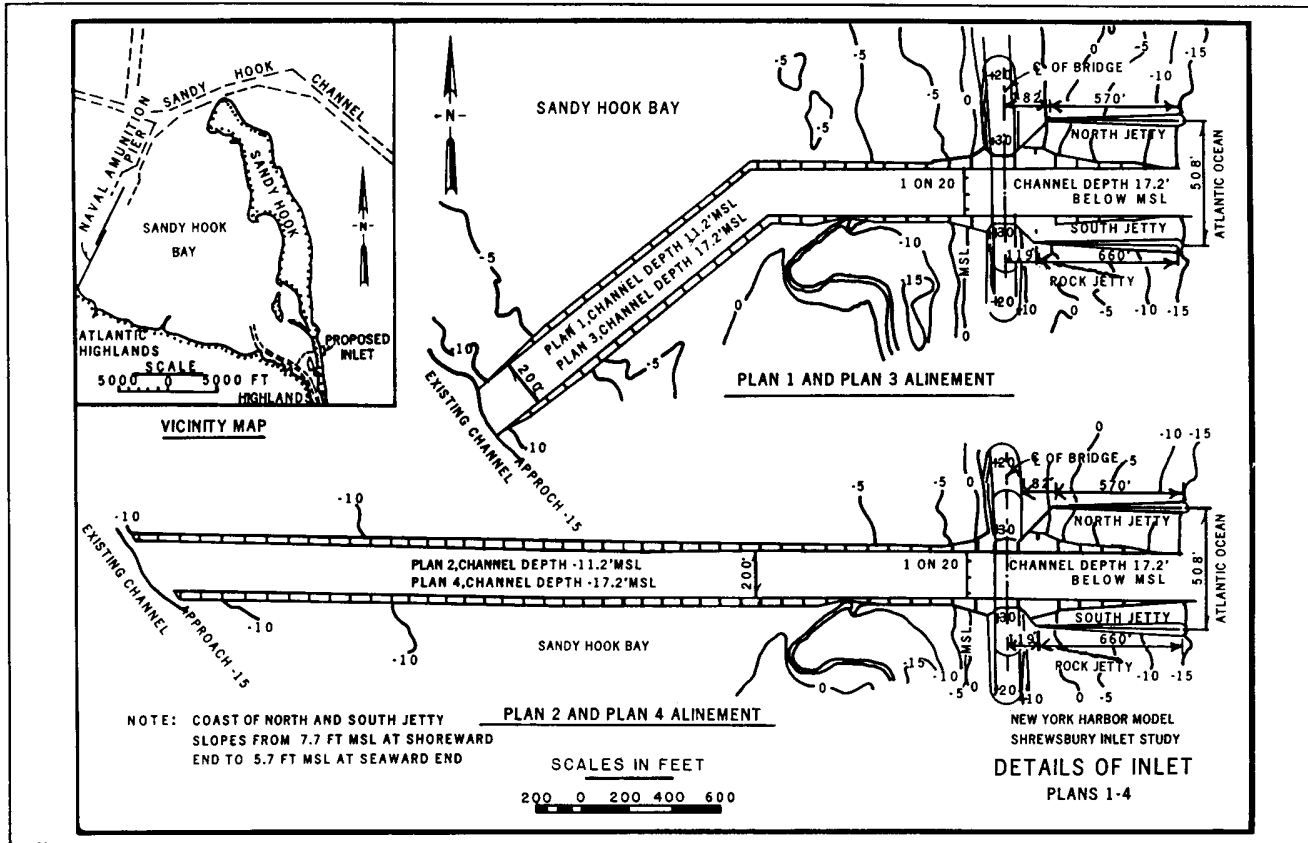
Details of plans of Shrewsbury Inlet physical model
